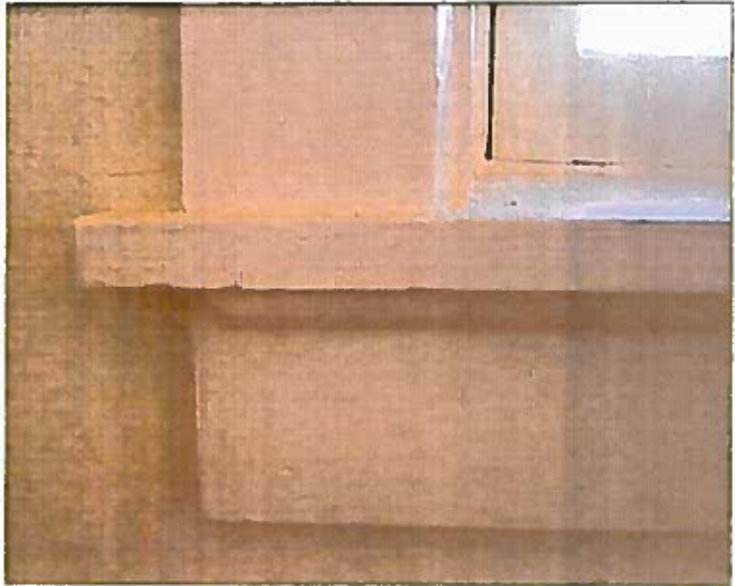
Window Stool at North Living Room Window, with Quarter-round.
